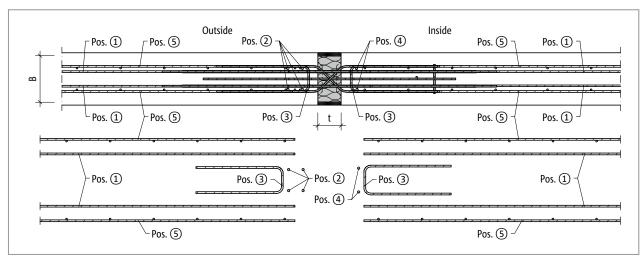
Schöck Isokorb® T type W: On-site reinforcement (layout)
